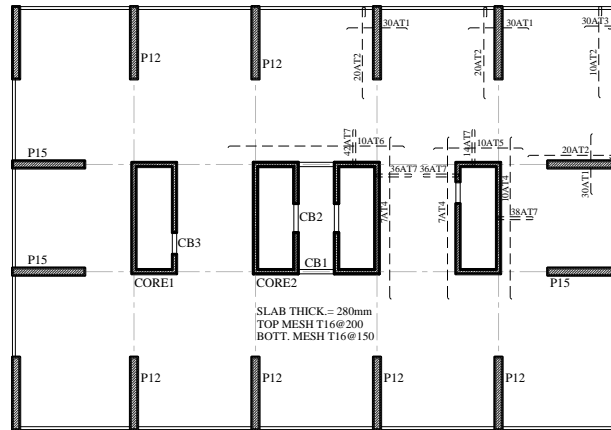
Typical reinforcement details of floor slabs - 40 and 50St buildings
